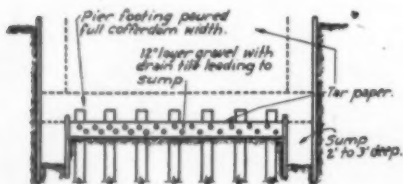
General details of gravel under-drainage bed and sump which aided in dewatering for the footing pour
